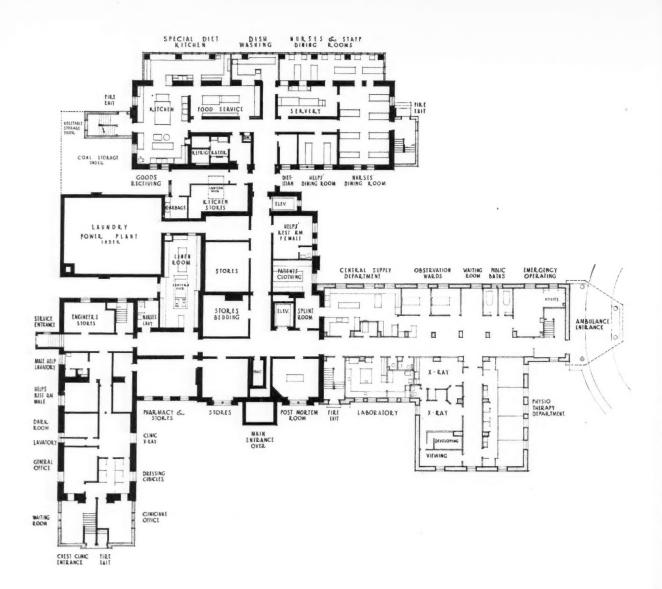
Ground Floor Plan (above) The new entrances to Chest Clinic on ground floor and isolation department on first floor are shown at bottom left. New ambulance entrance to hospital and new wing on right. Remodelled kitchen, food services and nurses' and staff dining rooms are at top left.
